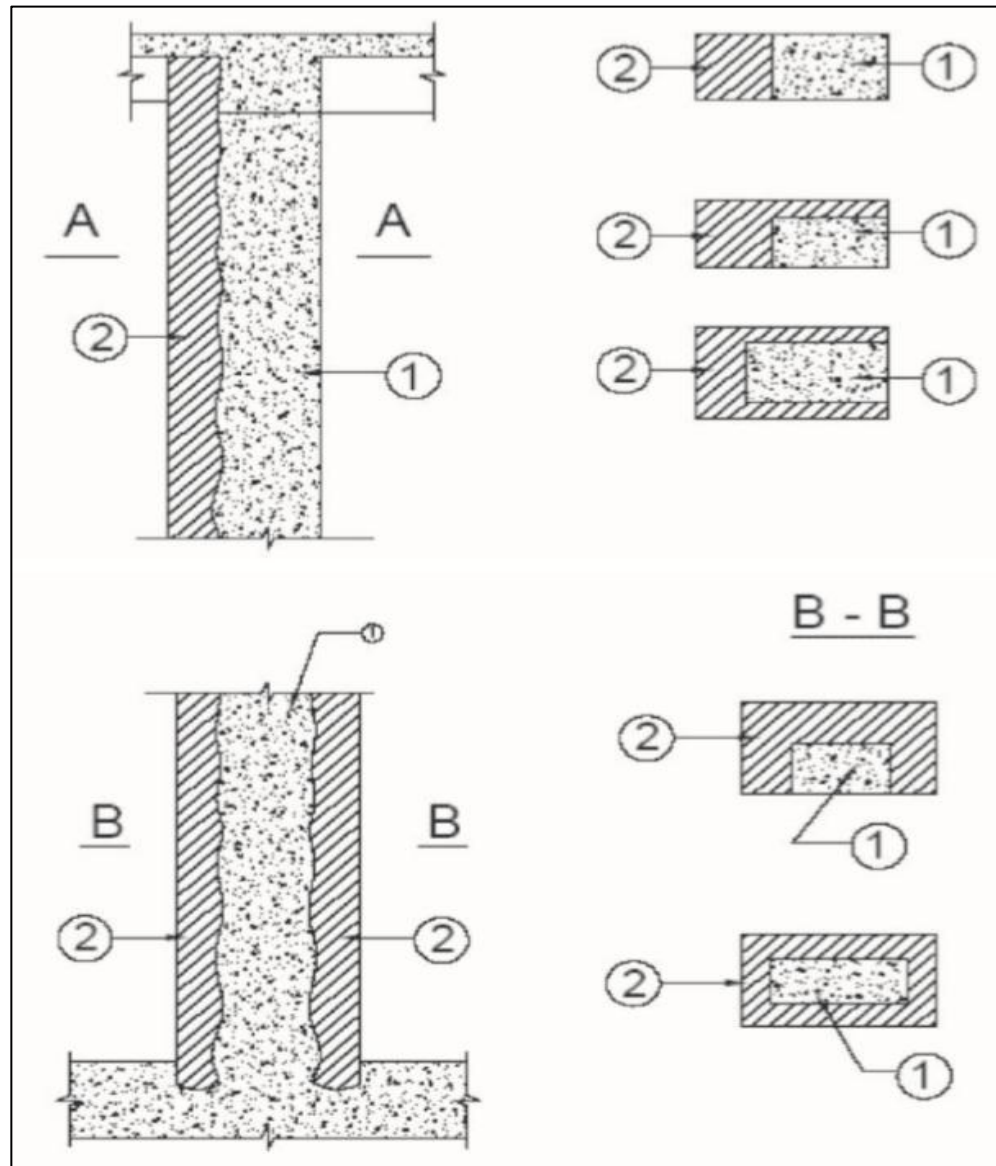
Repair of concrete columns by jacking (1. Existing column, 2. Jacking concrete)
